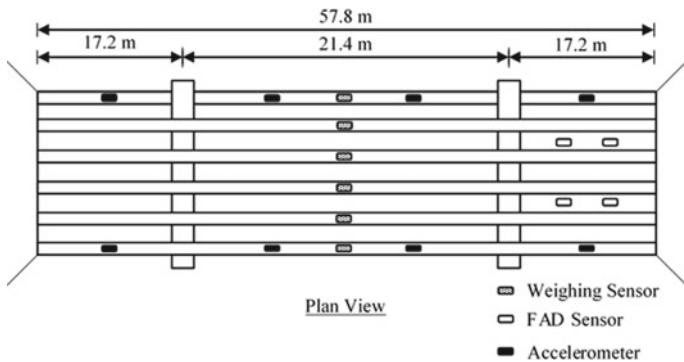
Sensor placement showing weighing and axle detection sensors as well as accelerometers
